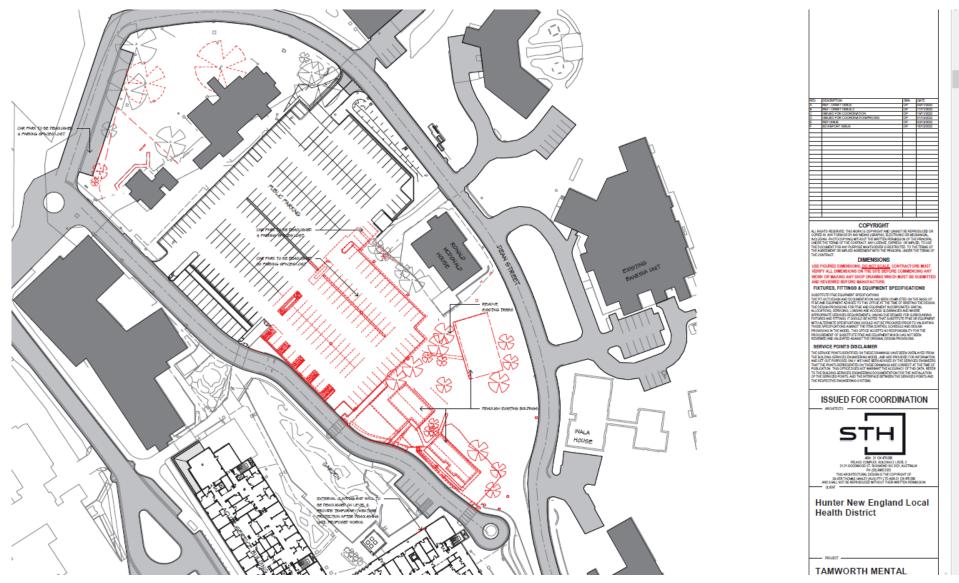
Proposed demolition and vegetation removal plan of the northern section of the subject area. *Source: Silver Thomas Hanley Pty Ltd 2022, A10-001
